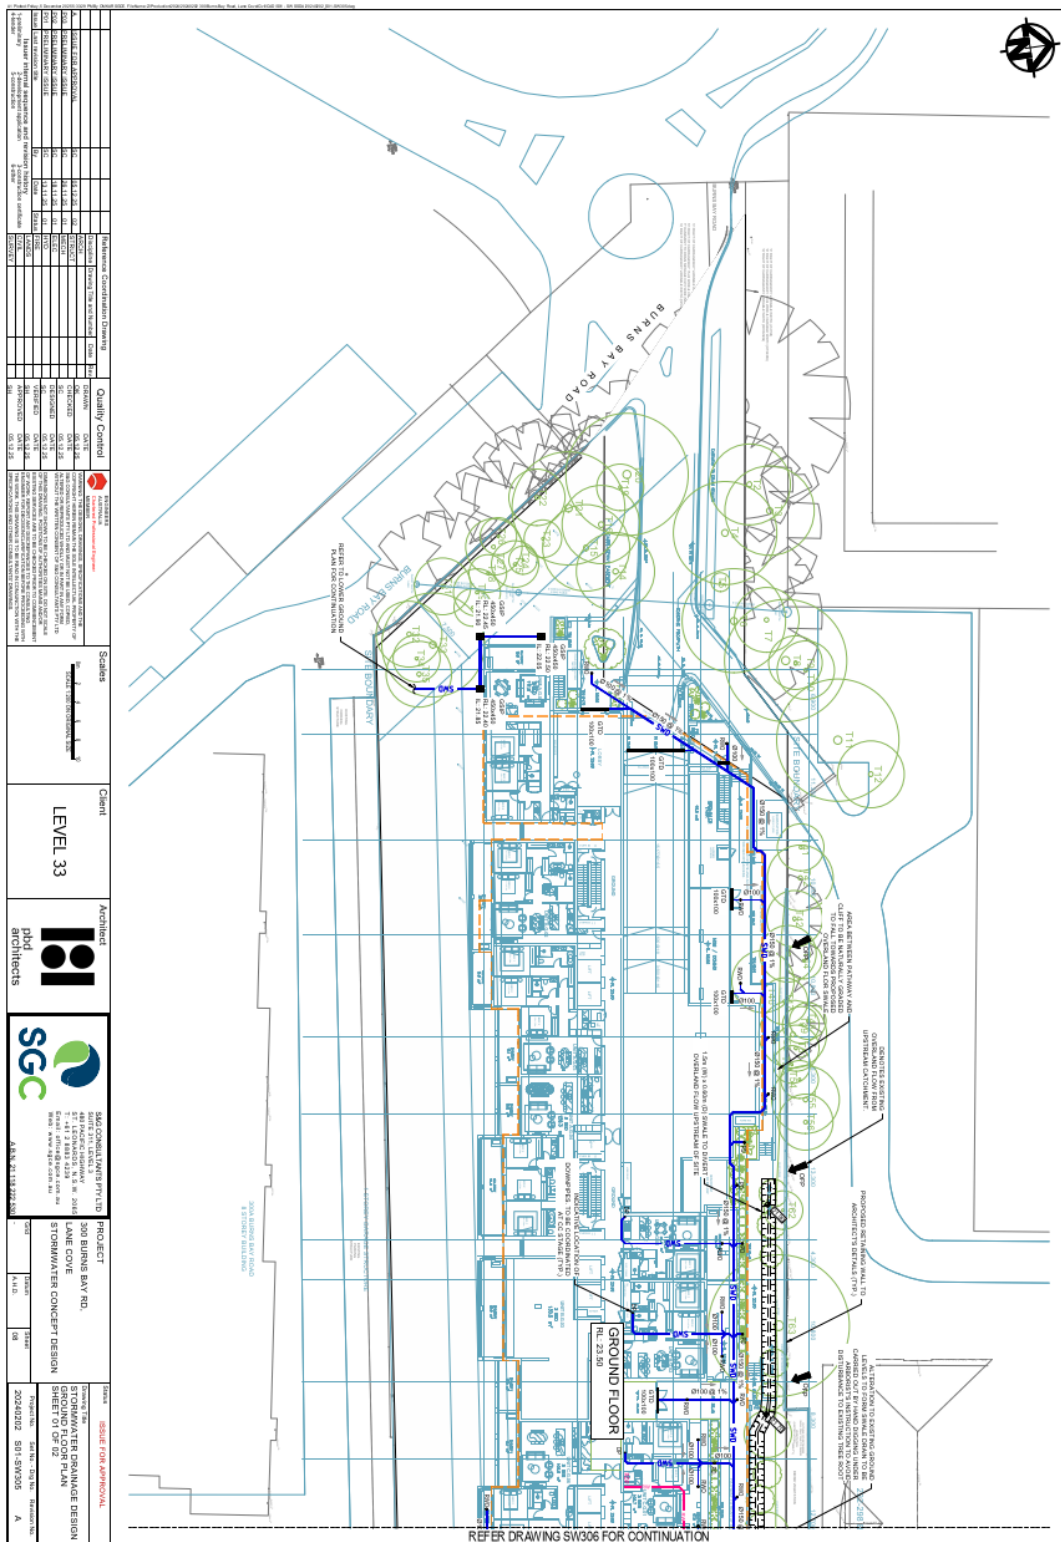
Stormwater Plan – Ground Floor – Sheet 1
